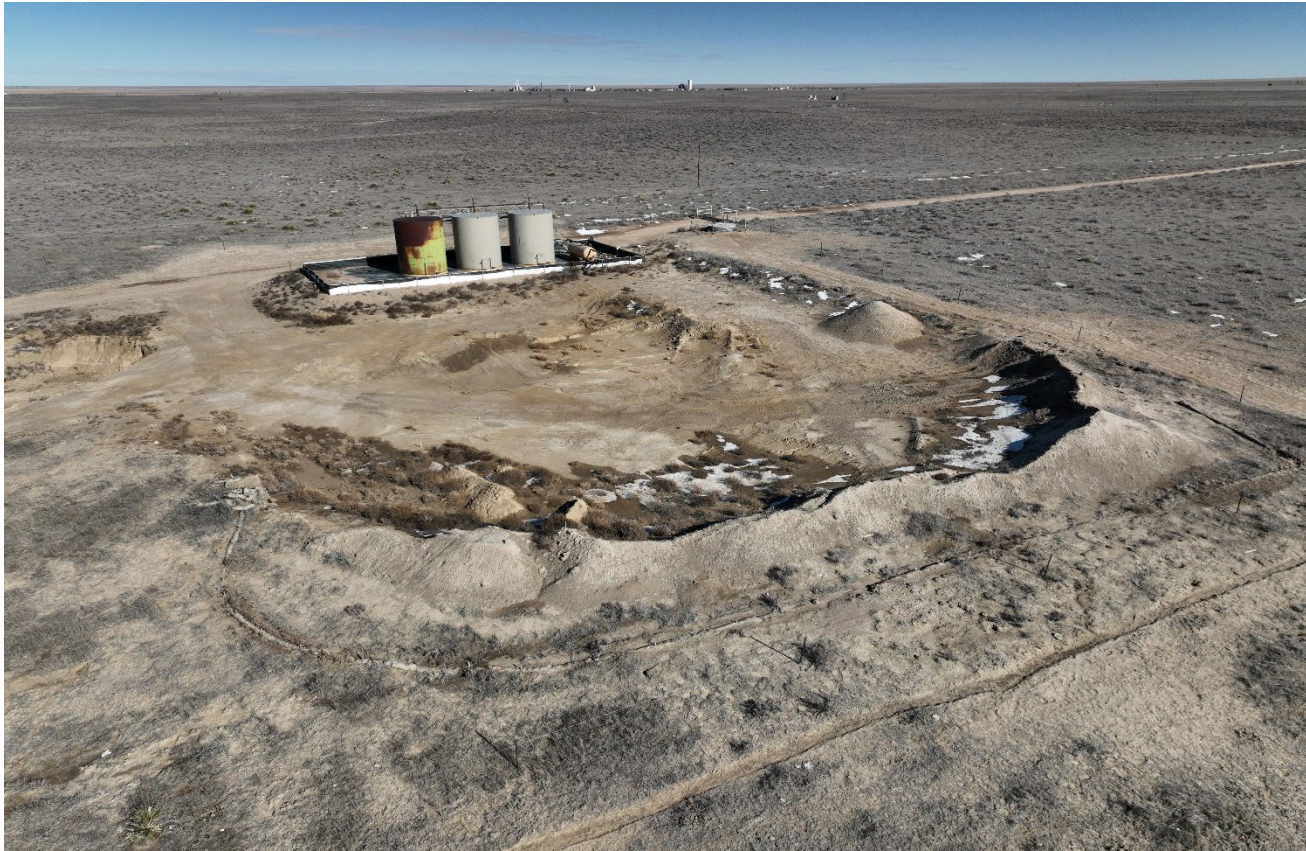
Facing northeast toward the tank battery. The soils stored at the south of the tank battery are not stabilized and BMP's are not maintained. Sediment has drifted south off the location.
